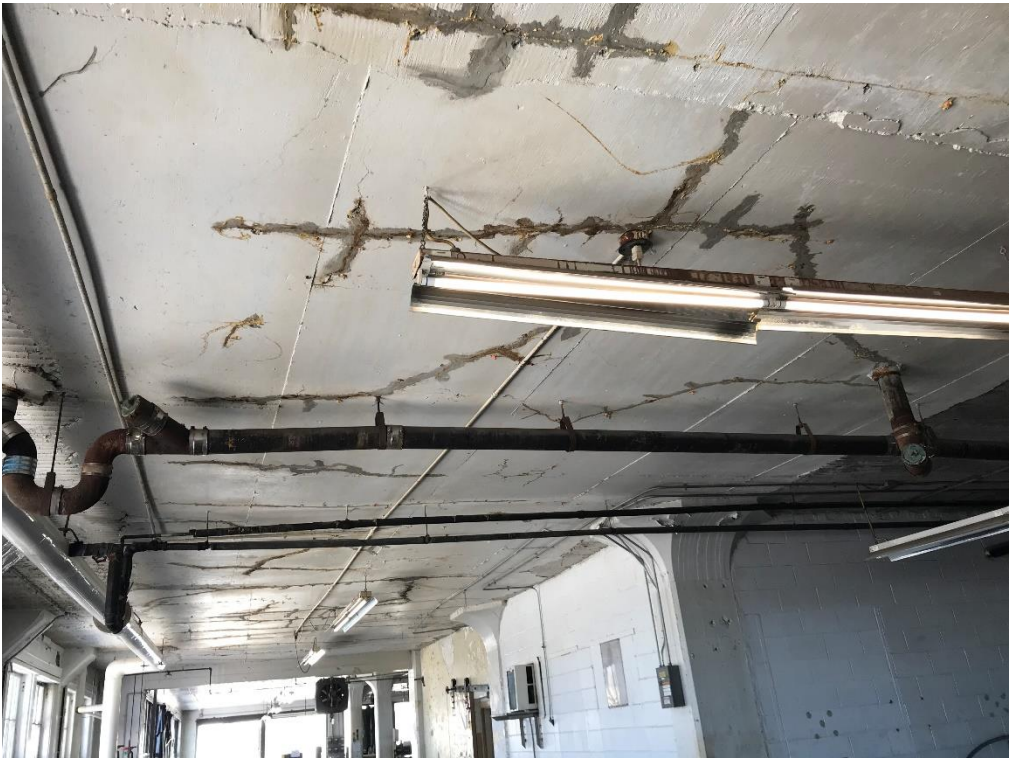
Main Factory Building. Epoxy injected crack repairs on the underside of the fourth floor.
